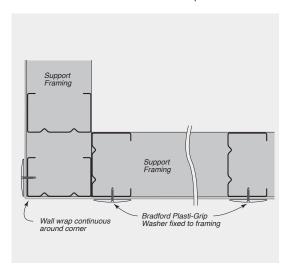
External Corner - Wall Wrap Overlapped
